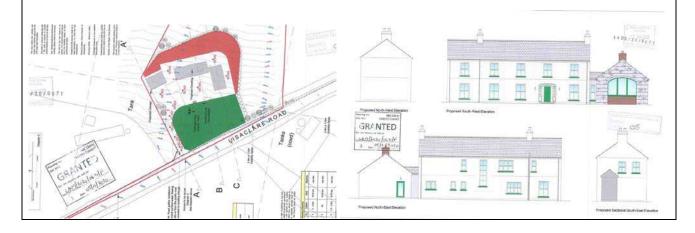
, 5 & 6 dwelling and garage to south LA09/2020/0671/F
